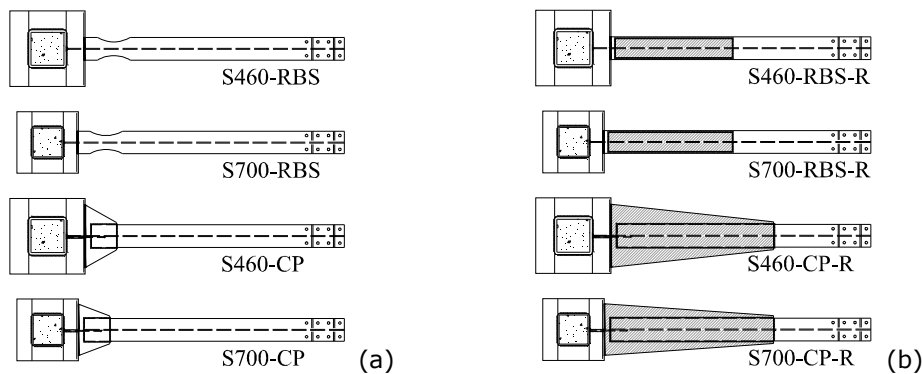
Designed joints (a), and corresponding joints with reinforced beam (b)
